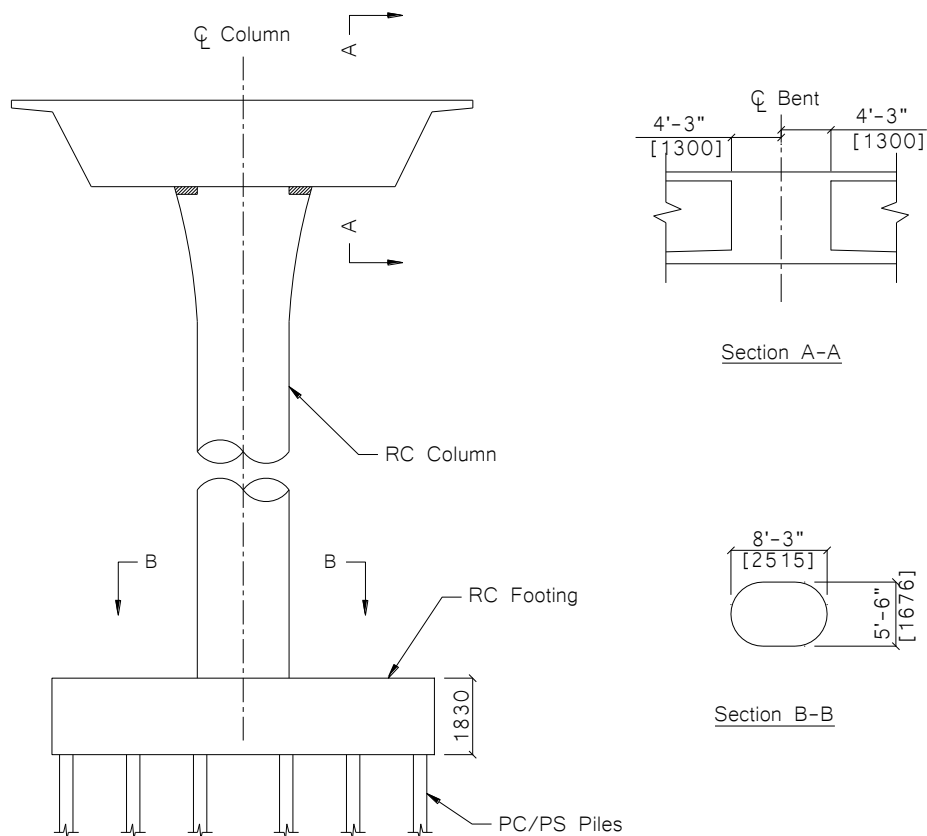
Typical bent layout in Frame 2, Bridge 4
